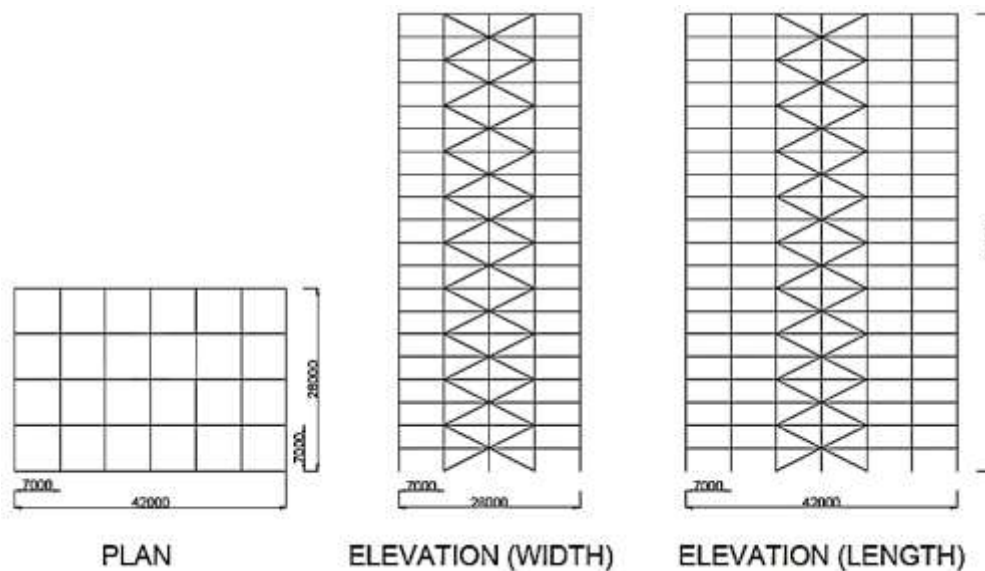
Structure Dimensions (Plan, Elevation along Width and Length)
